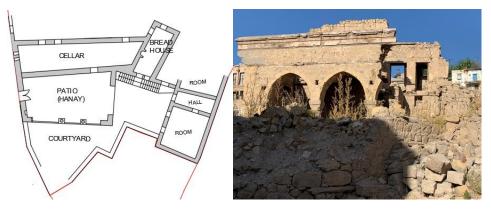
An example of a house with hanay on the corner of Malik Street in Kayabasi district (the sketch belongs to the author). Partial survey could be taken as part of the house was destroyed, September 2022 (author archive)
